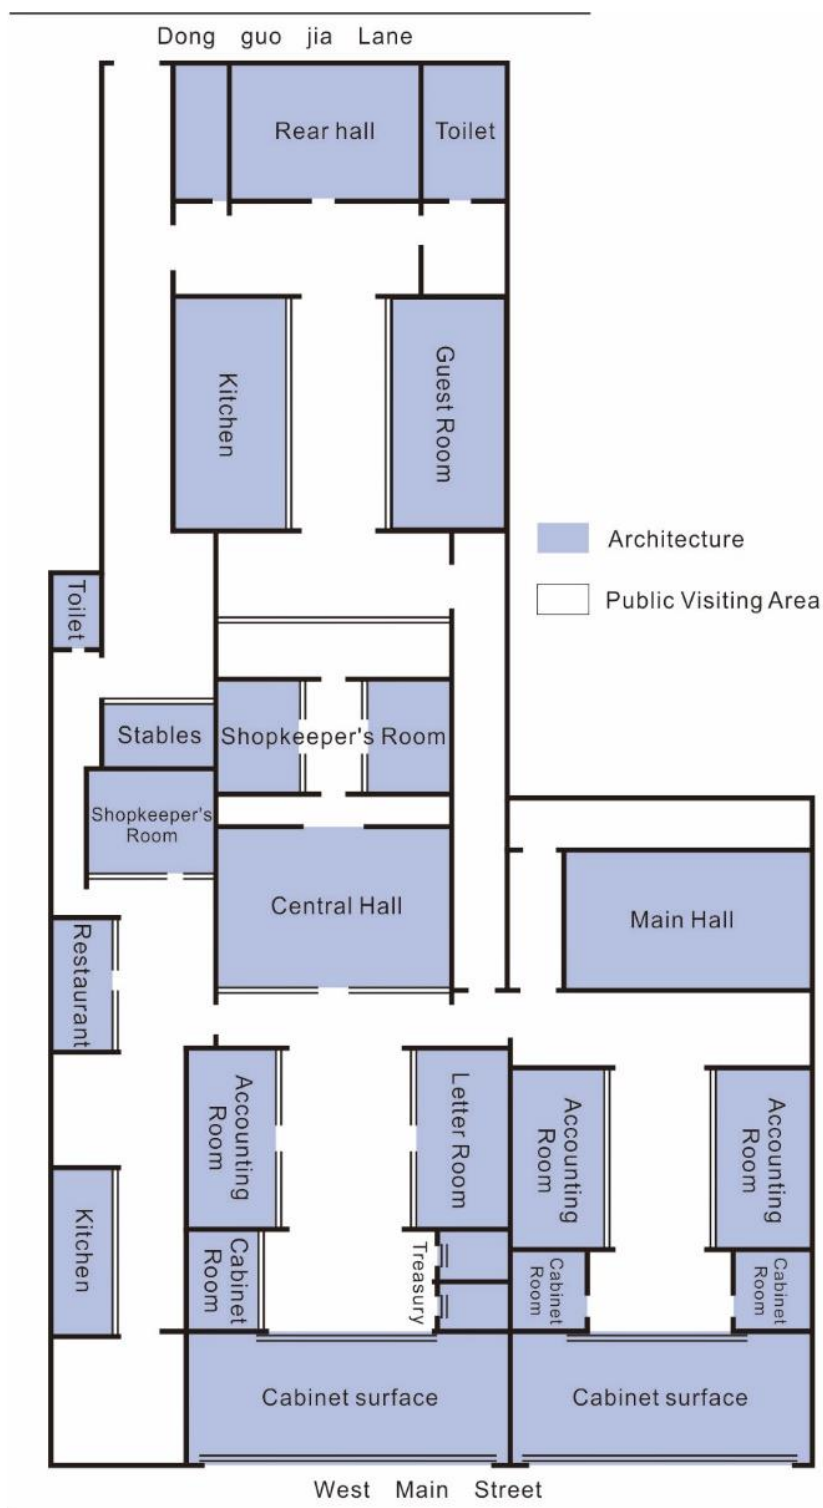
Layout Plan of the Pingyao Ri Sheng Chang
